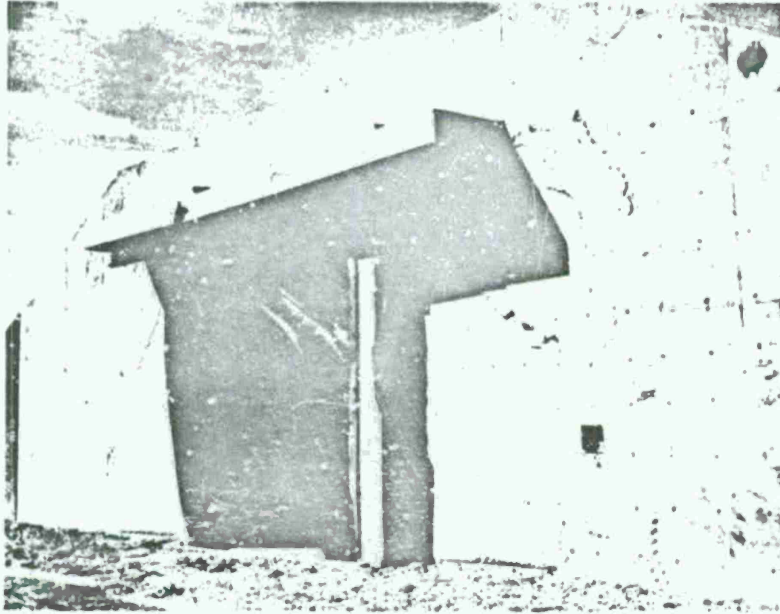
Doorway of Igloo B Showing Damaged Headwall and Doors.
